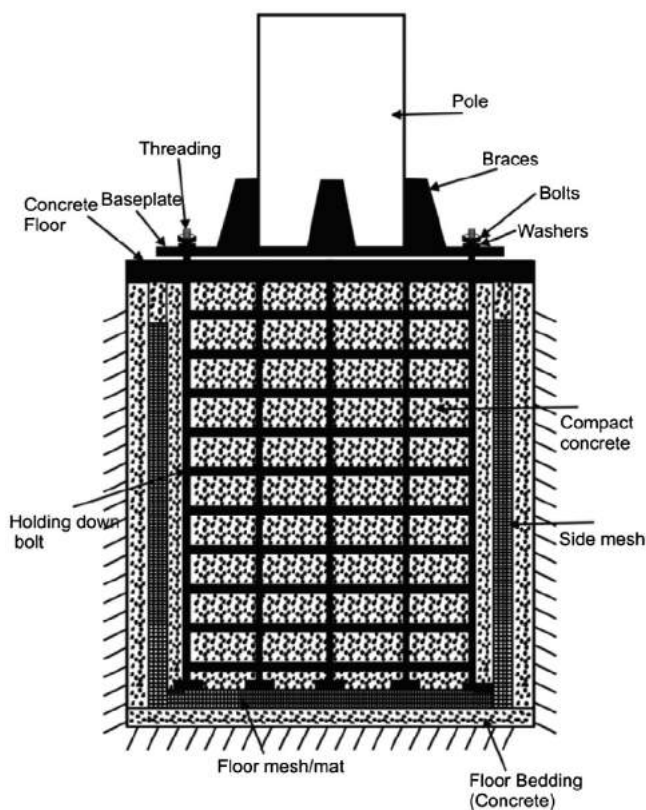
Cross-sectional Drawing of how to Install Unipole. Source: Fieldwork, 2016.
